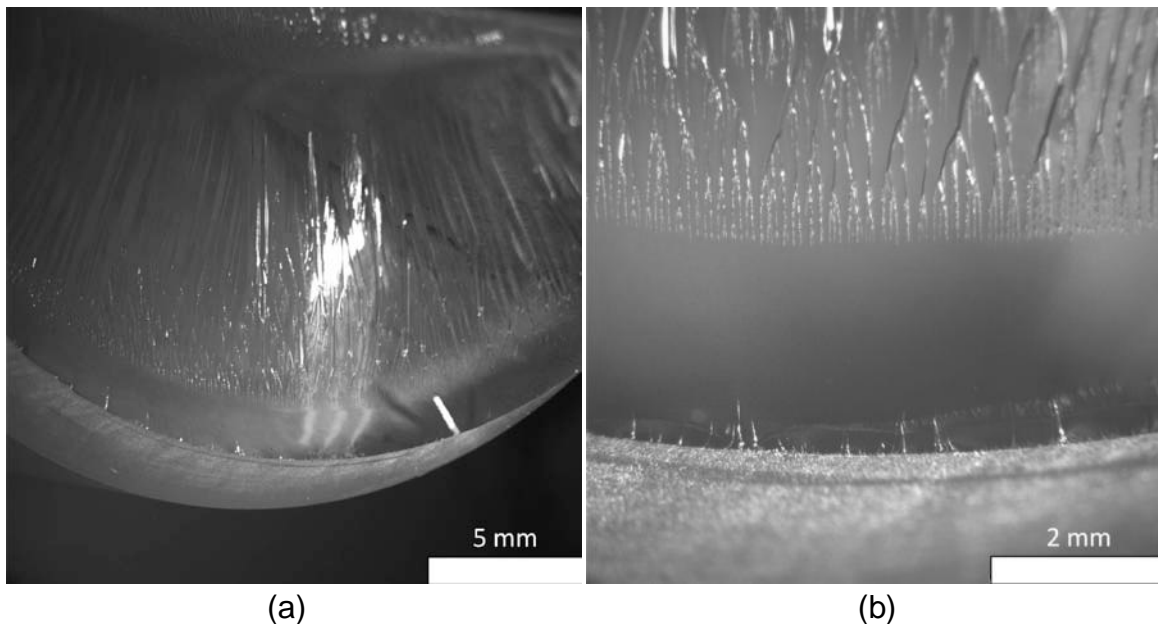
Images showing the fracture surface of GB4-3.
